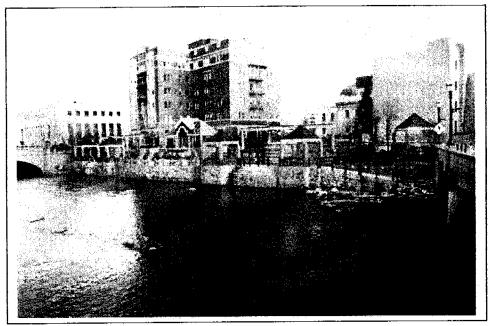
Section J, north bank, west of Sierra Street, camera facing northeast, 10/24/01.
